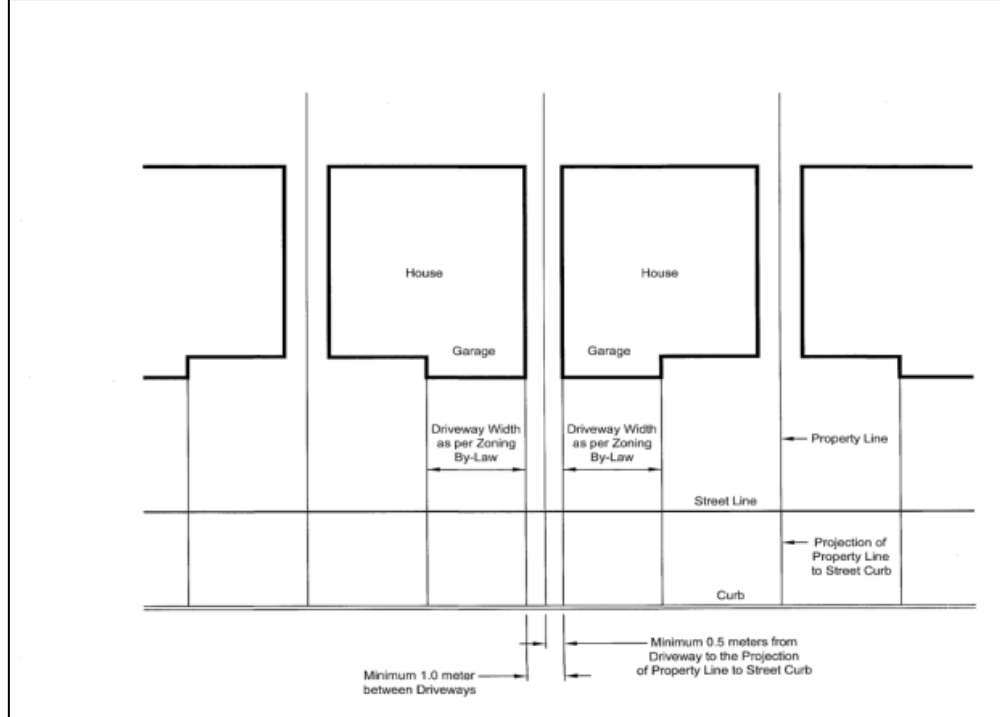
City of Vaughan, Figure 1, Minimum spacing between driveways at the Street Curb - Straight Street
